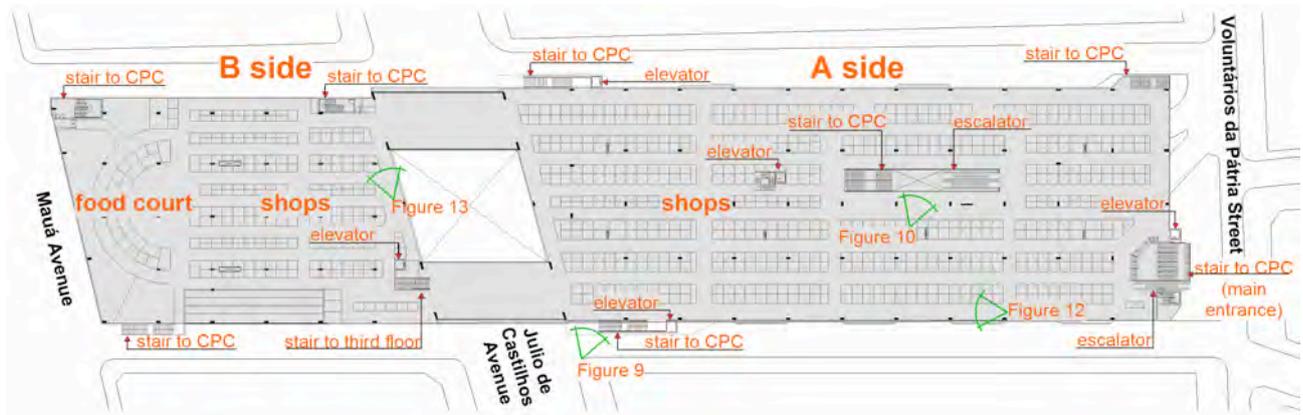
CPC second floor plan. (Source: Adapted from Prefeitura Municipal de Porto Alegre, 2009).
